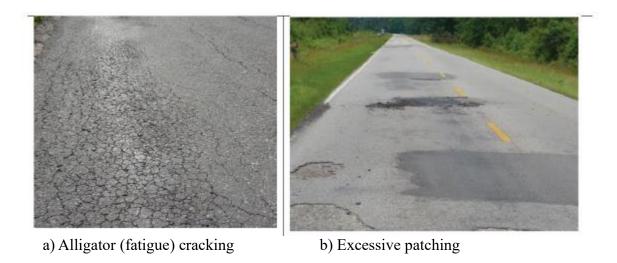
Photo. Pavement Distress suitable for FDR (CP Tech Center)
